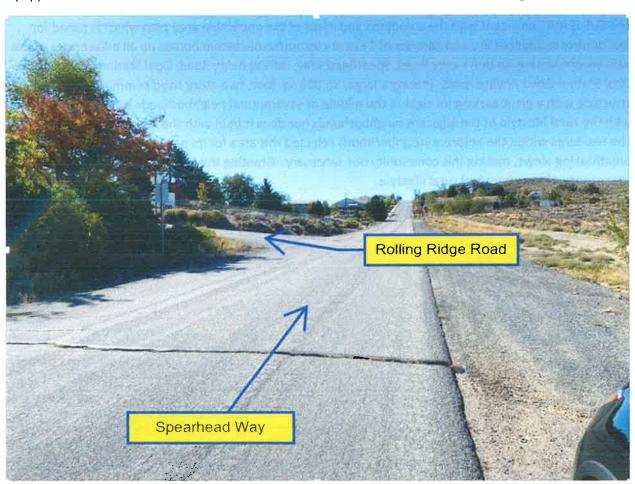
The Intersection of Spearhead Way and Rolling Ridge Road
